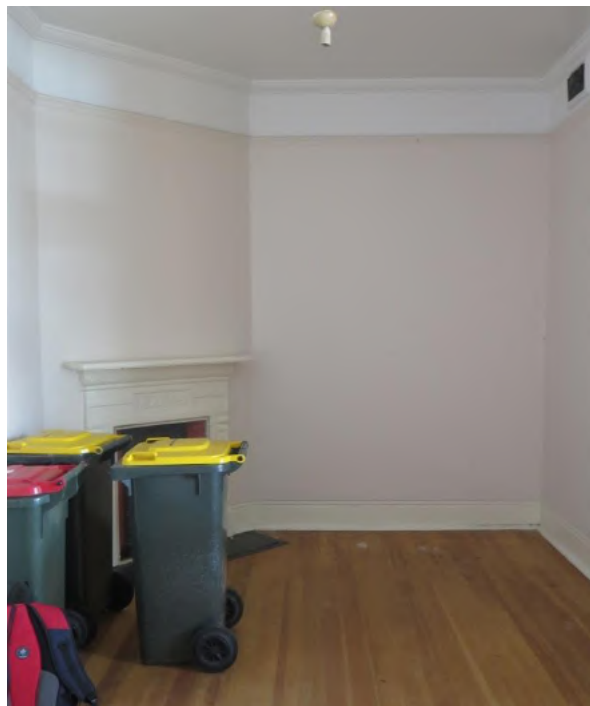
Front bedroom (space G.2) showing timber floors, rendered wall finishes, rendered cement skirting, timber picture rail and cast iron chimney piece—56B / 46–56 Gloucester Street. (Source: GML Heritage, June 2016)
